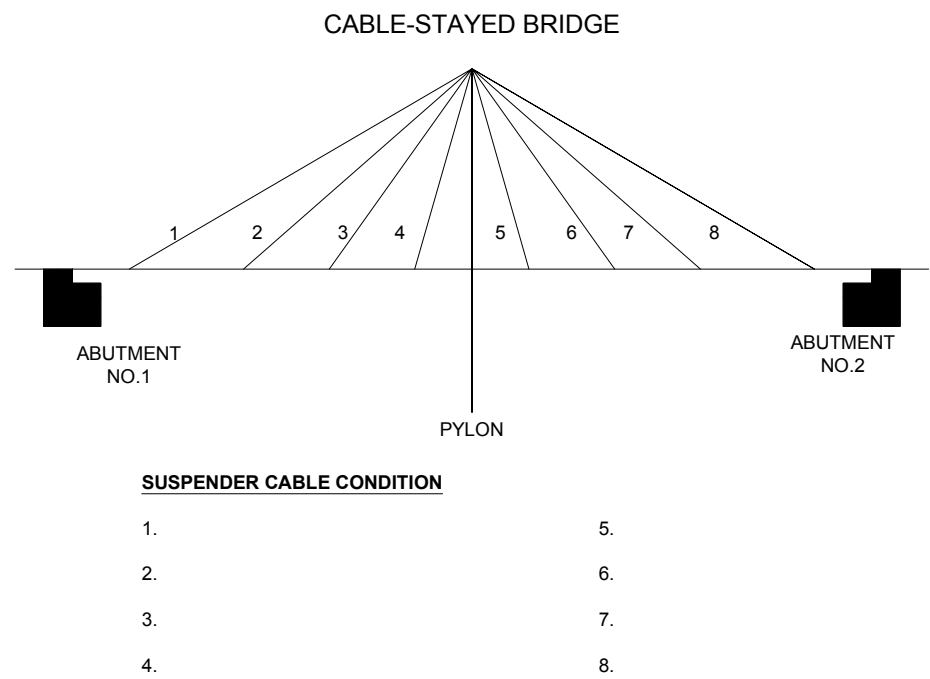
Form for Recording Defects in Cable System of a Cable-Stayed Bridge
